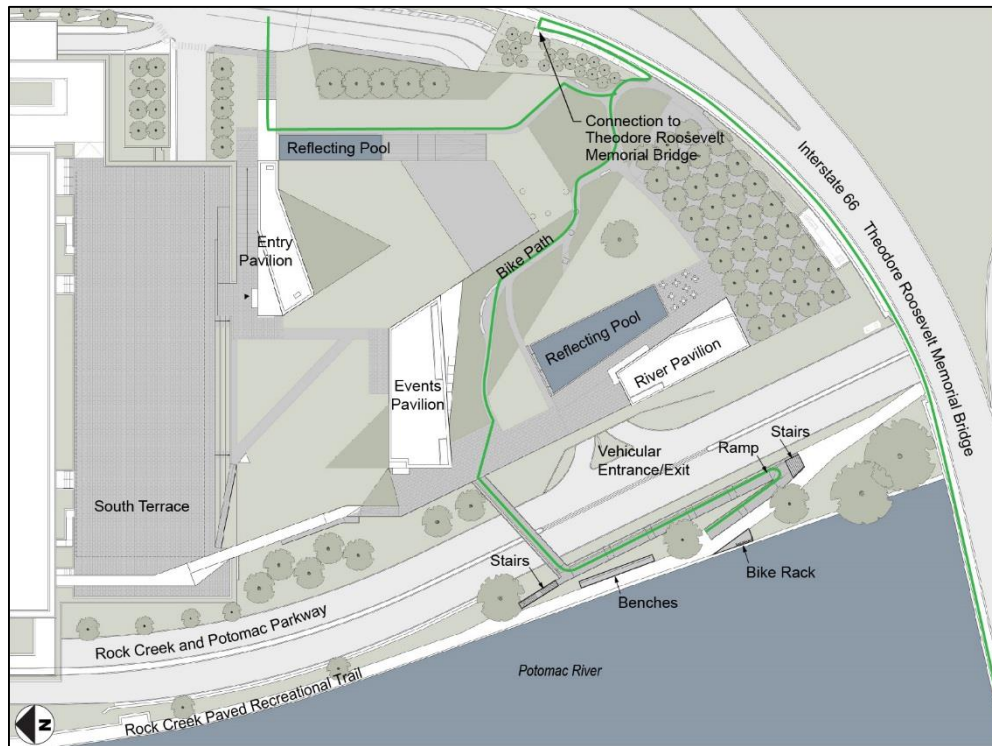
Bridge Access with Ramp and Stairs Alternative, plan view (not to scale) showing the proposed bicycle route (in green) from the Rock Creek Paved Recreation Trail through the site of the Expansion Project.
